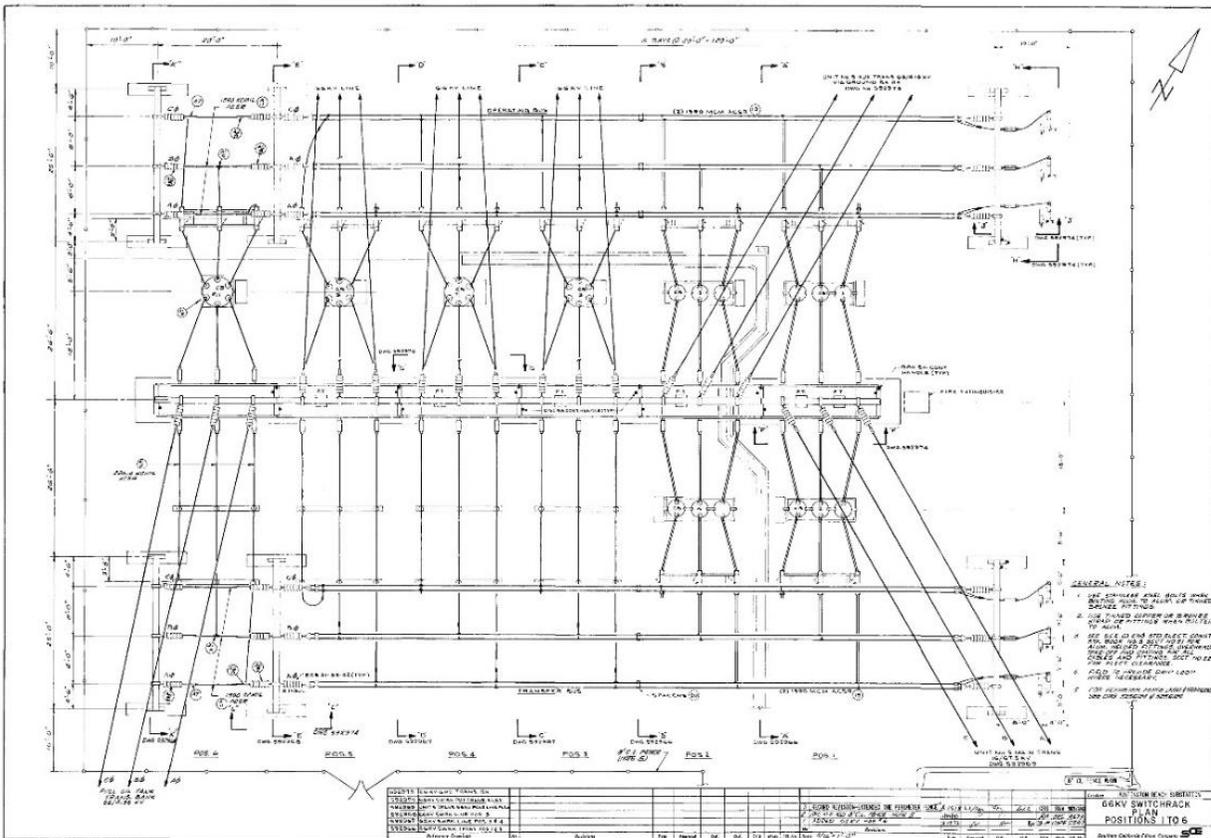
Huntington Beach 66kV Switchyard – Existing Layout / No Available Switch Positions
